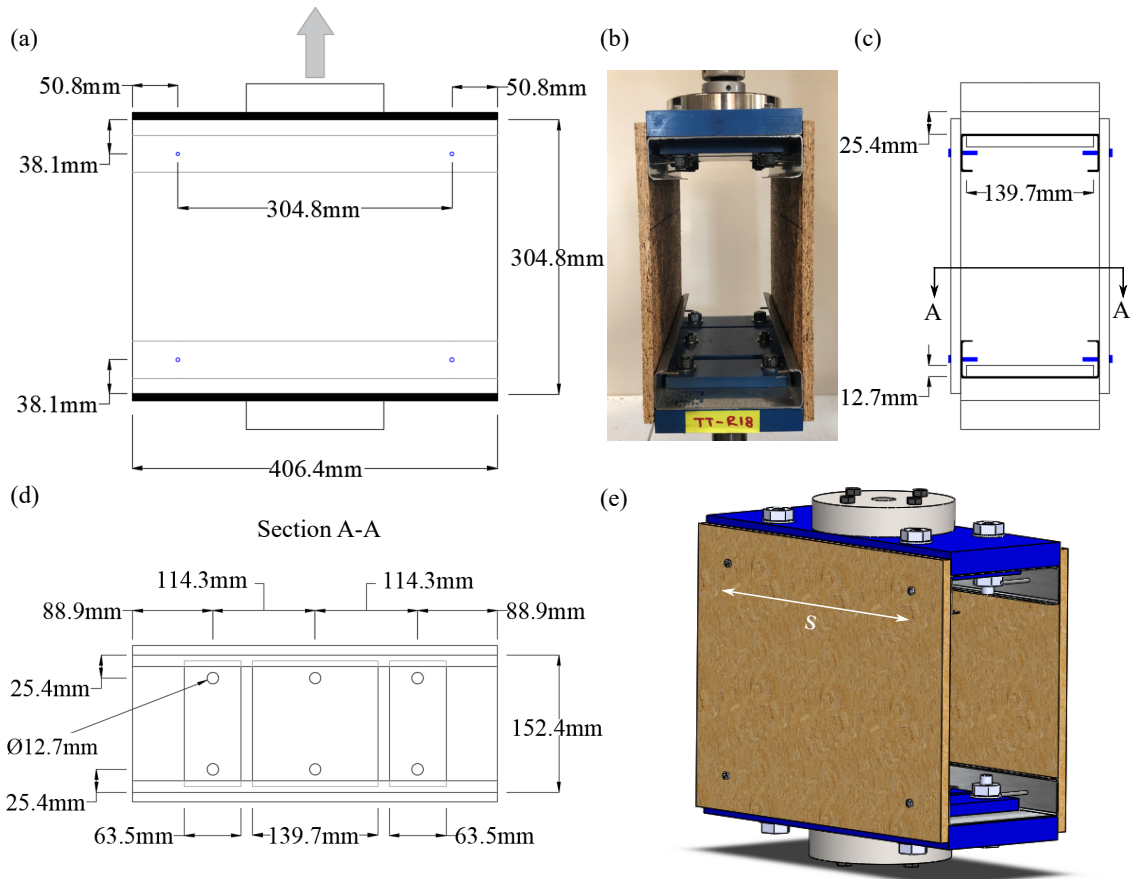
Test rig and connection specimens (stud-screw-sheathing). (a) Front view of the specimen indicating loading direction, (b) actual test specimen photo in the rig, (c) side view of the specimen indicating steel plate dimensions, (d) inside view of the specimen representing A-A section, and (e) isometric view of the specimen indicating the fastener spacing  $s=304.8$  mm. A test program of 30 identical experiments is conducted to examine connection variability.
